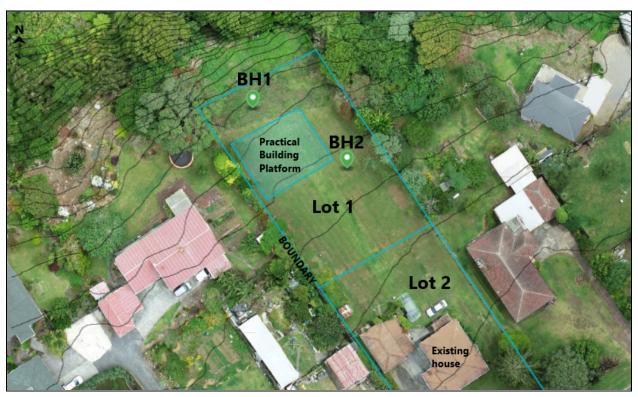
Borehole Location Plan (maps adapted from Scheme Plan and DroneX Aerial Survey).
